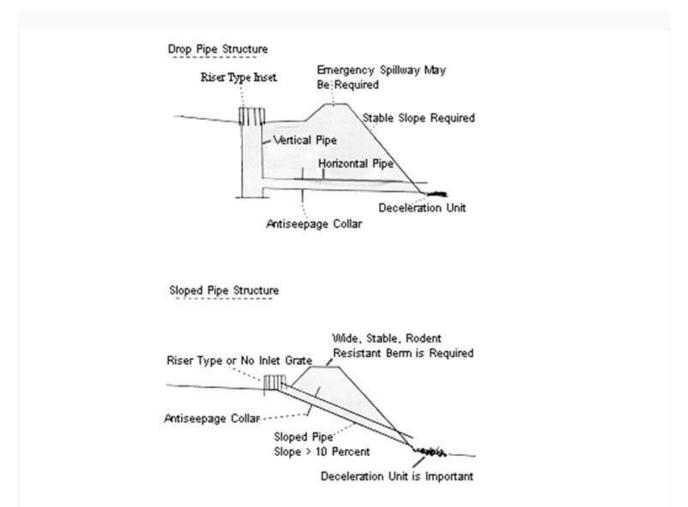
Diagram showing Drop pipe structure and Sloped pipe structure.
